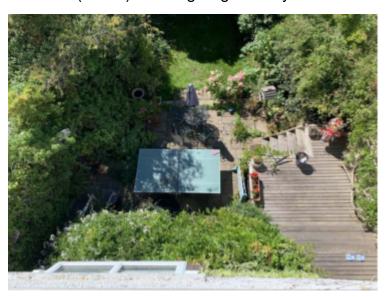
(above): Existing raised terrace at No. 24 as viewed from above
